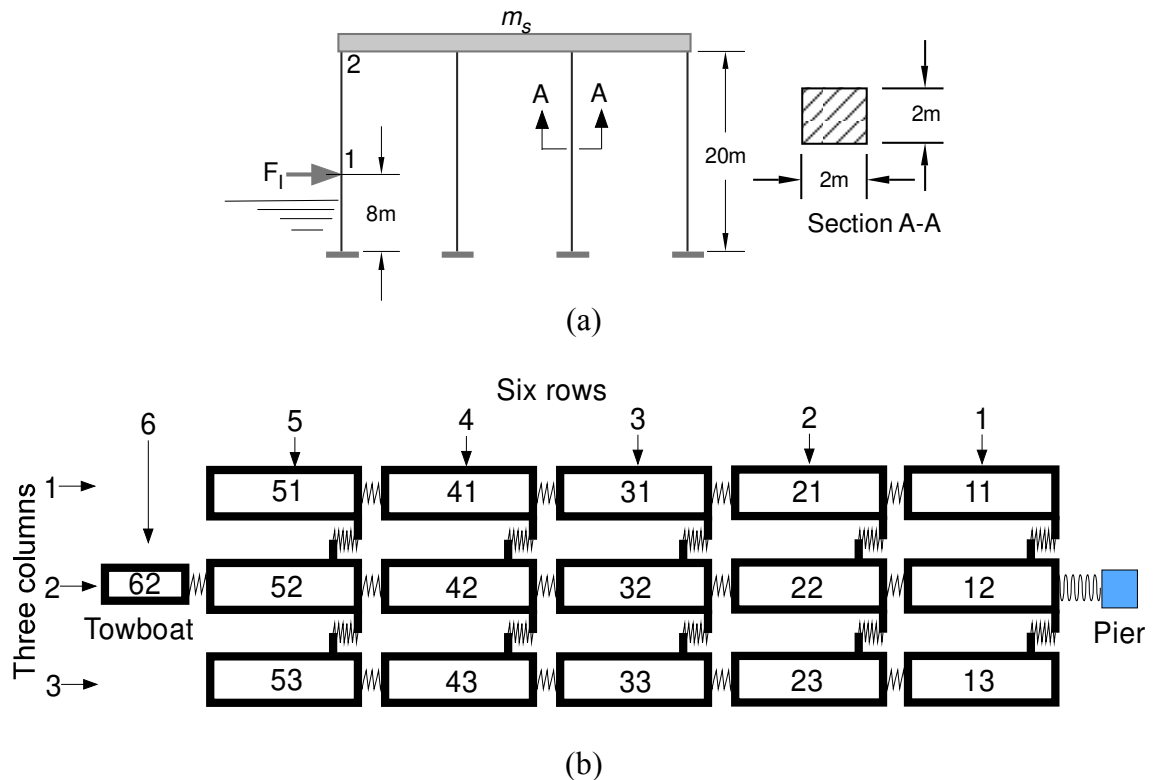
Example conditions: (a) layout of the pier frame; (b) layout of the 15-barge flotilla including a towboat
